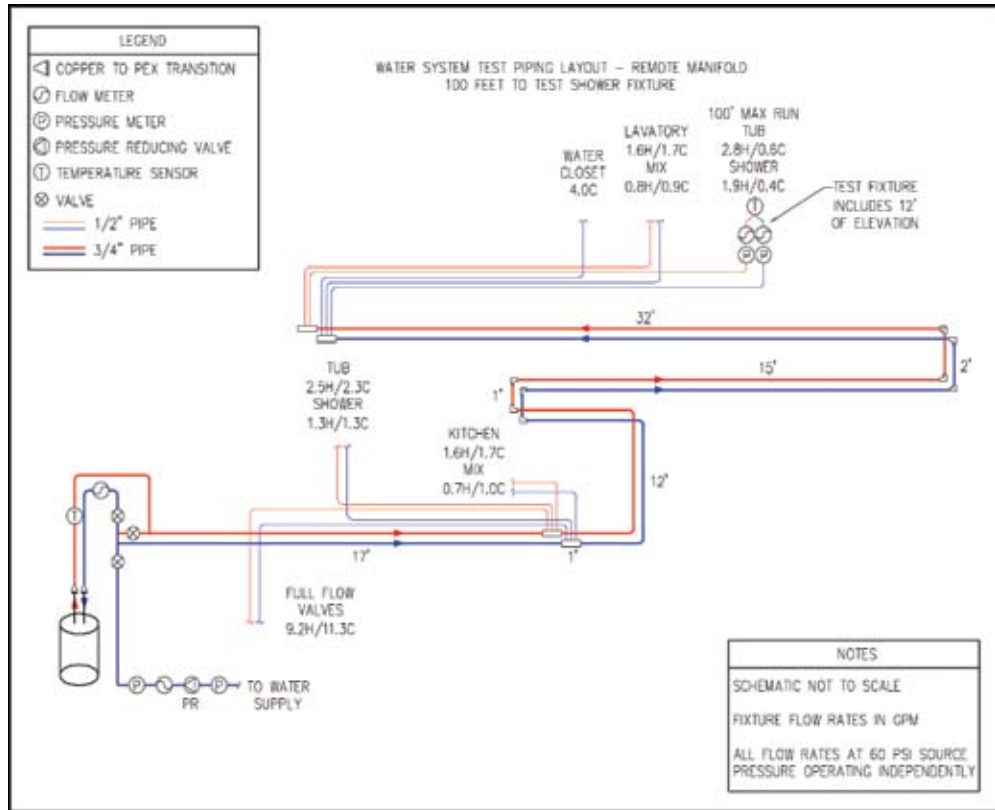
Water System Test Piping Layout – Remote Manifolds, 100’ to TF
